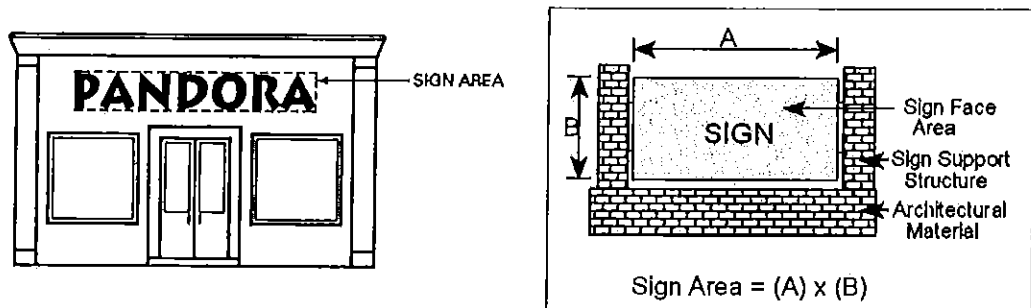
1: Illustration of sign area calculation for a wall sign (left) and a ground sign (right).
